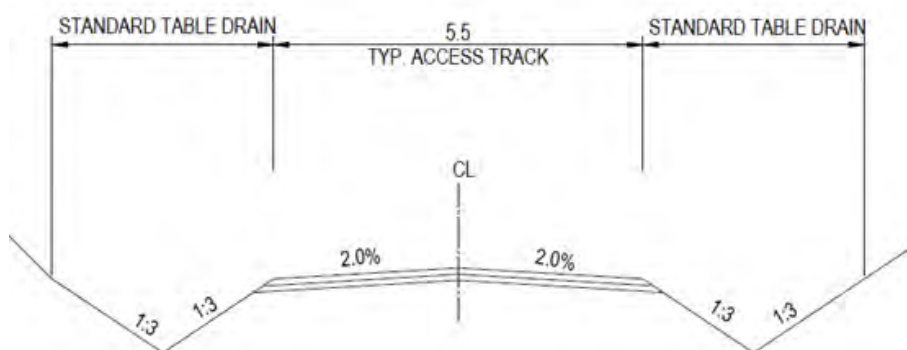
Typical road cross section (Project roads will have a trafficable width of 5.5 – 6.0 m)
